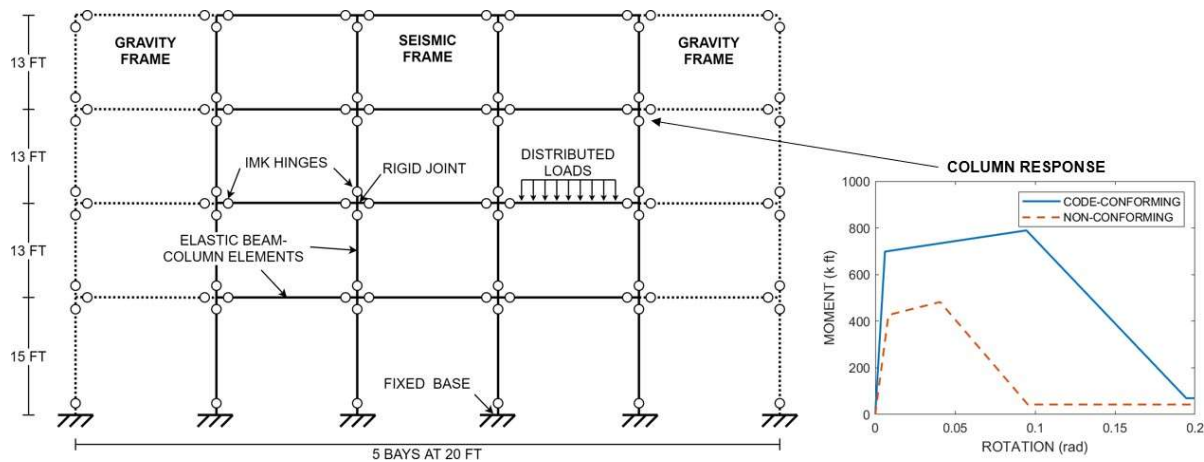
Diagram of geometry and modeling of exterior frames, with three-bay seismic-resisting bays perimeter frame and two gravity frame bays. Typical column backbones for perimeter frame in 4-story buildings definition are shown.
